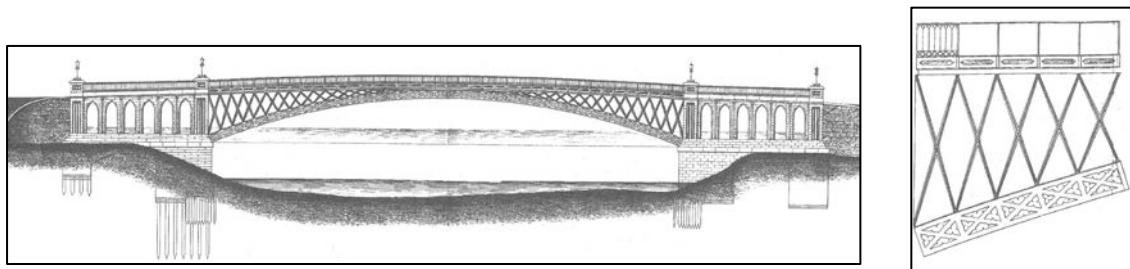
(above), Mythe Bridge, general view. Figure 81 (right), detail of arch rib, spandrel bracing and railings. The four columns and capitals at each end of the masonry flood arches were also of cast iron (Mackenzie 1838)
